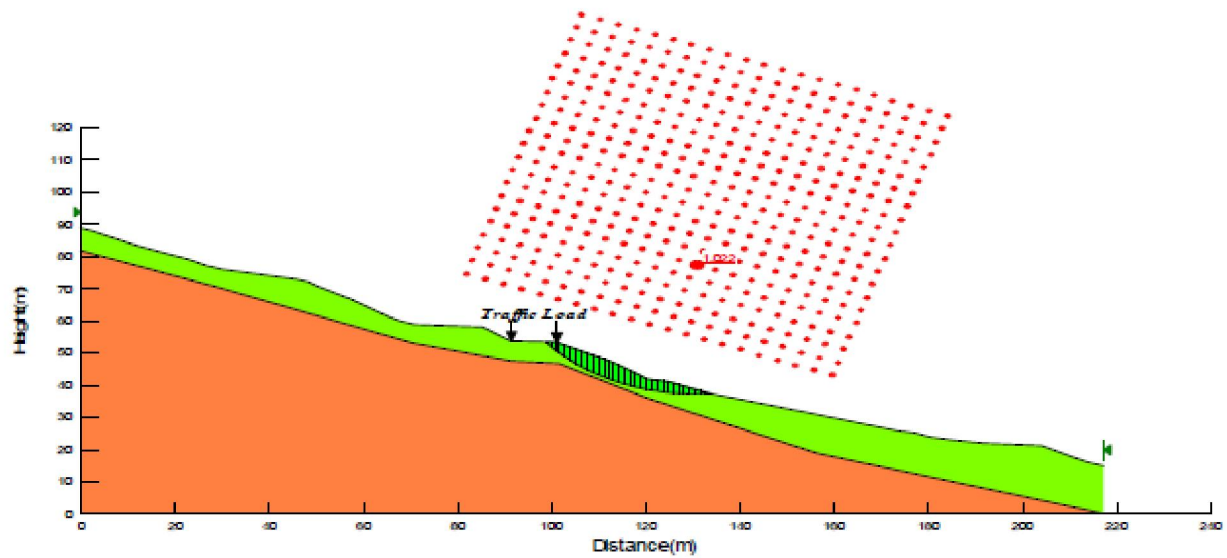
Slope stability in A-A section in effective soil stress conditions (quasi-static mode)
